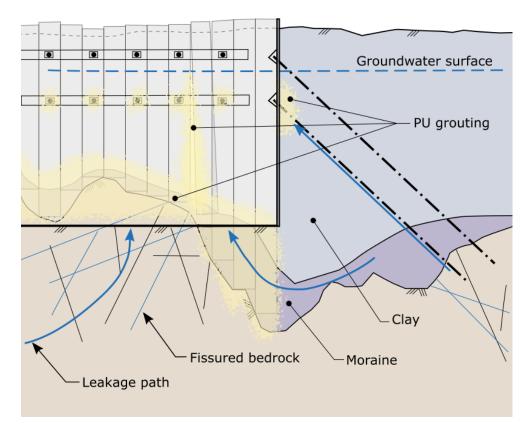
Sealing of gaps in retaining structure below groundwater table with polyurethane (PU) grouting to prevent drainage into the excavation.
